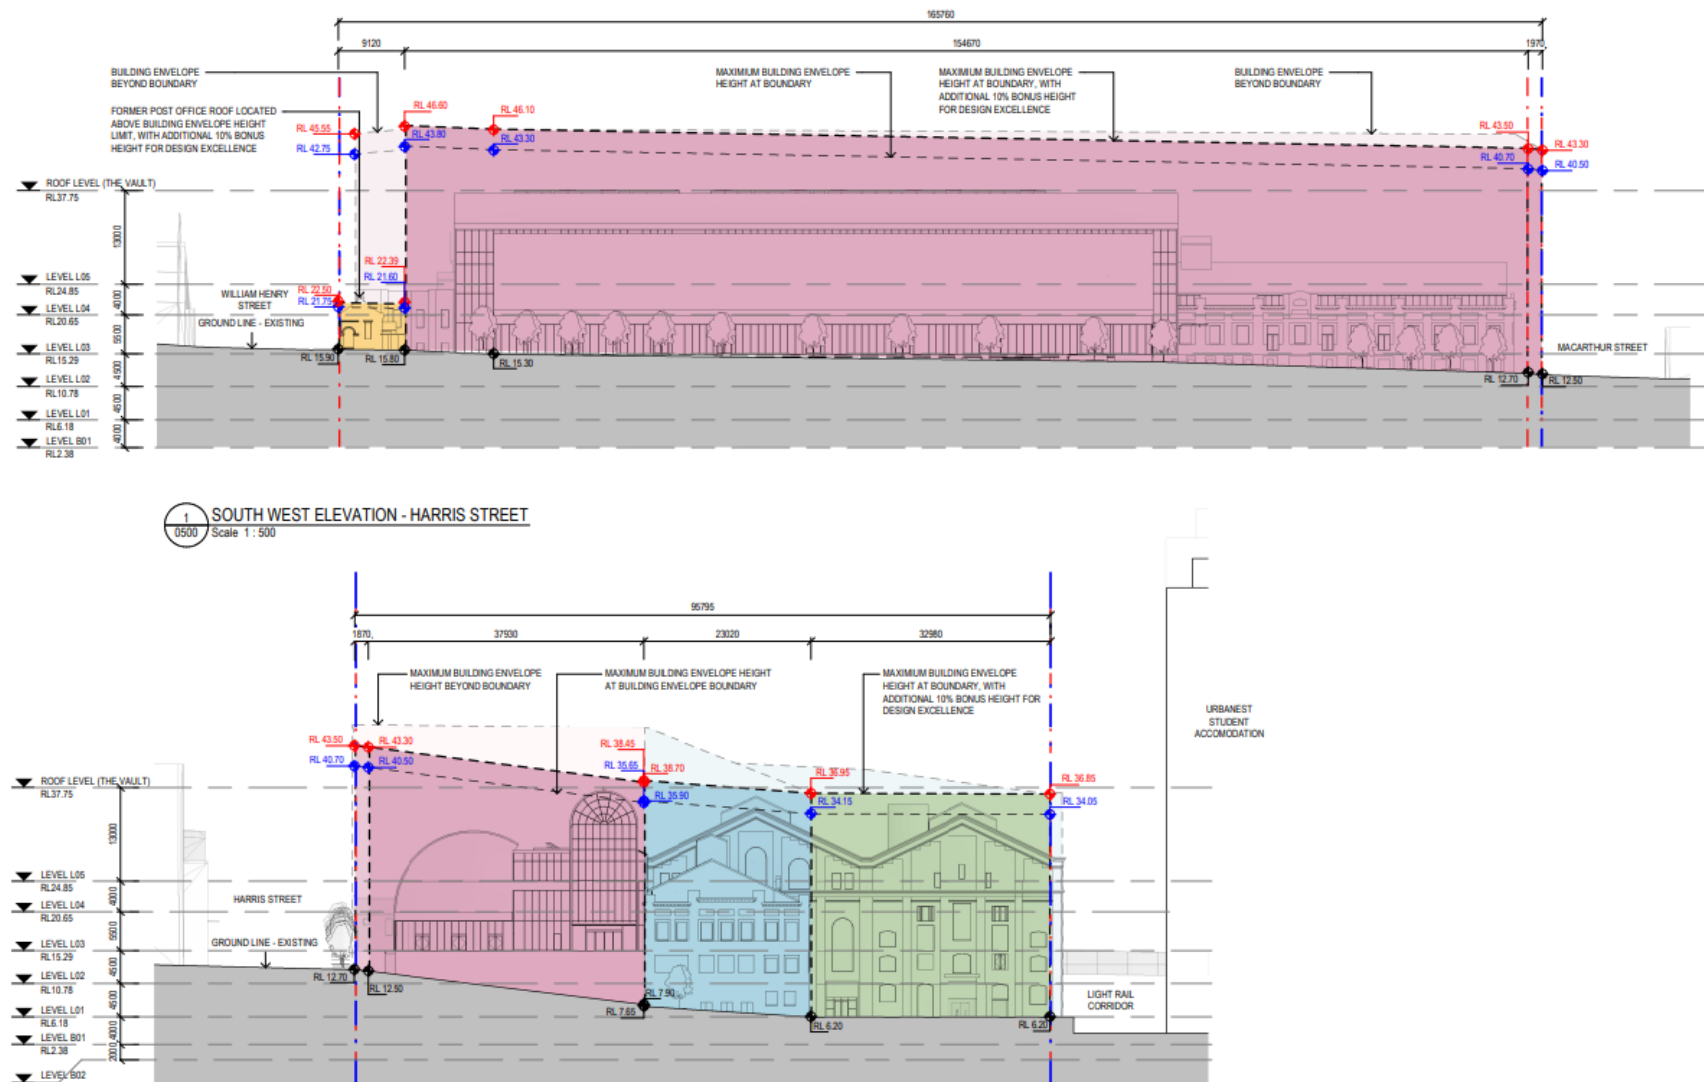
Ultimo Powerhouse- Building Envelope SE & SW Elevation (Source: John Wardle Architects, 17 May 2022)
